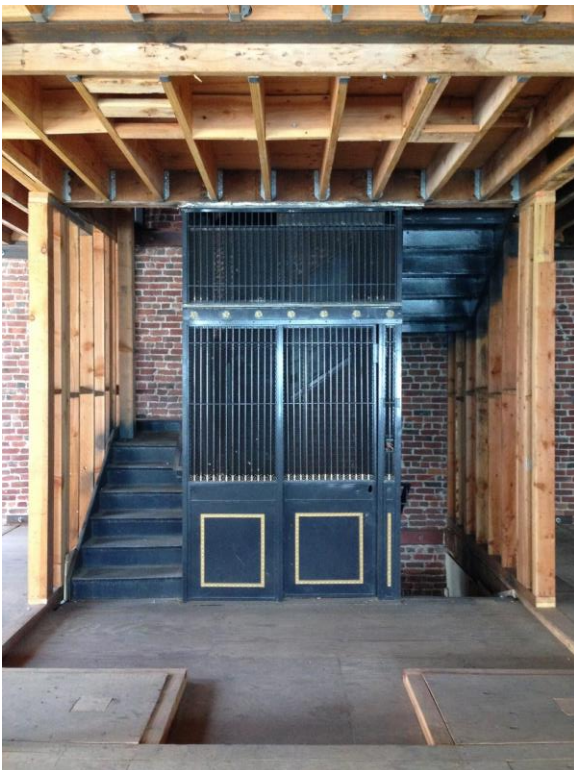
Detail view of stairs and elevator with ornamental metal cage at southern wall. Note differential settlement of elevator landing from the remainder of the building (photograph taken on 02/27/2018).
